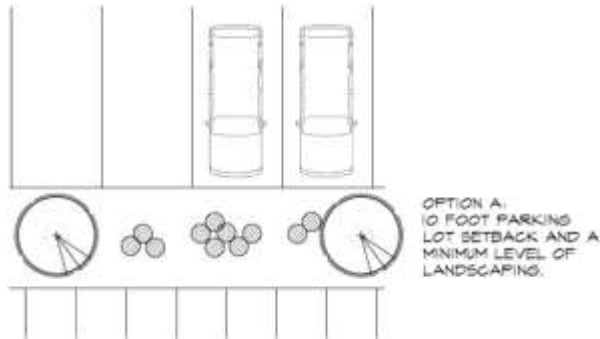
Typical 10' Landscape Strip – Mixture of Plant Sizes
